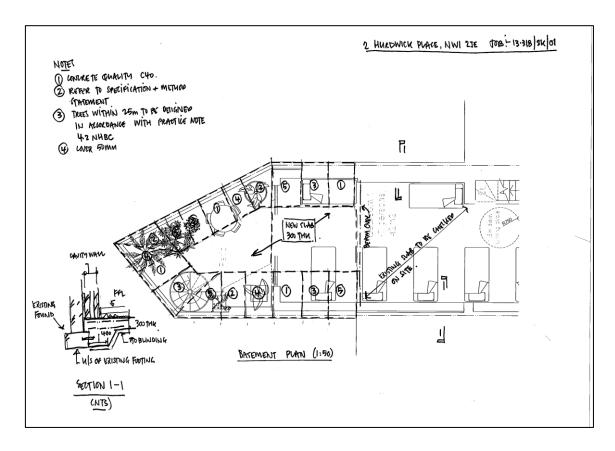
St. Eng. Sequence for underpinning, foundations and new Basement slab.
